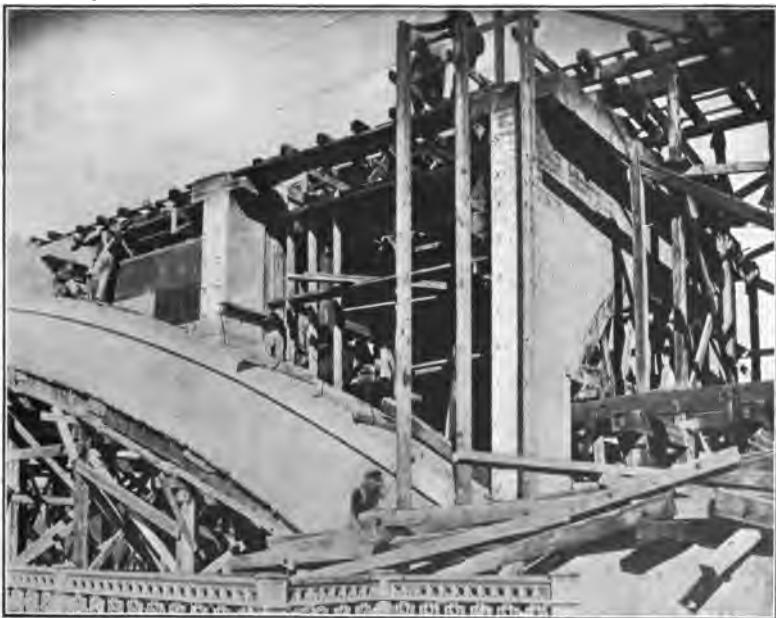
FLOOR-BEAMS READY TO START FORMS FOR SPANDREL WALLS.
